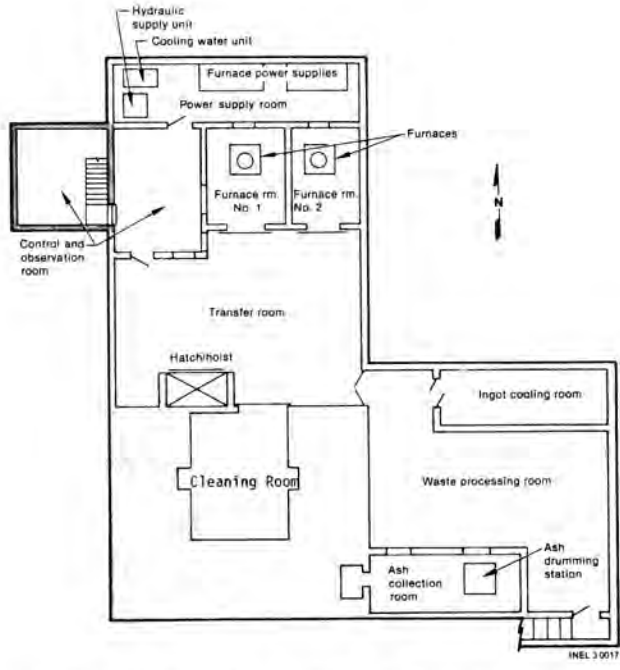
Waste Experimental Reduction Facility - Basement Floor Plan
